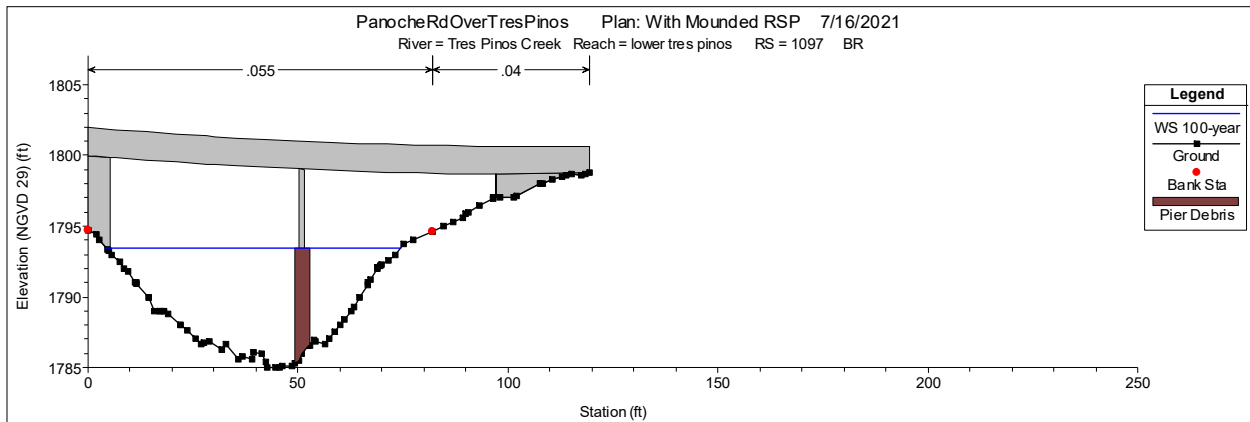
Proposed Bridge Cross Section (Facing Downstream/Southwest)
